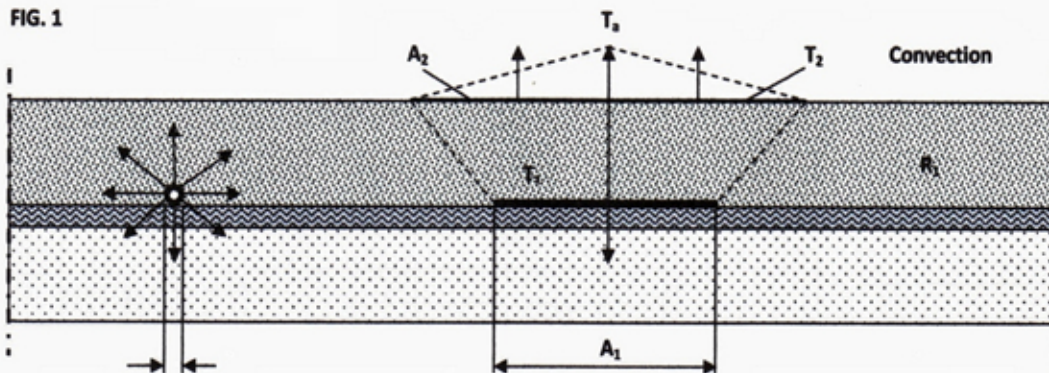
shows a cross sectional area of a floor with a cable or tubing and EP Warmfloor flat element.
